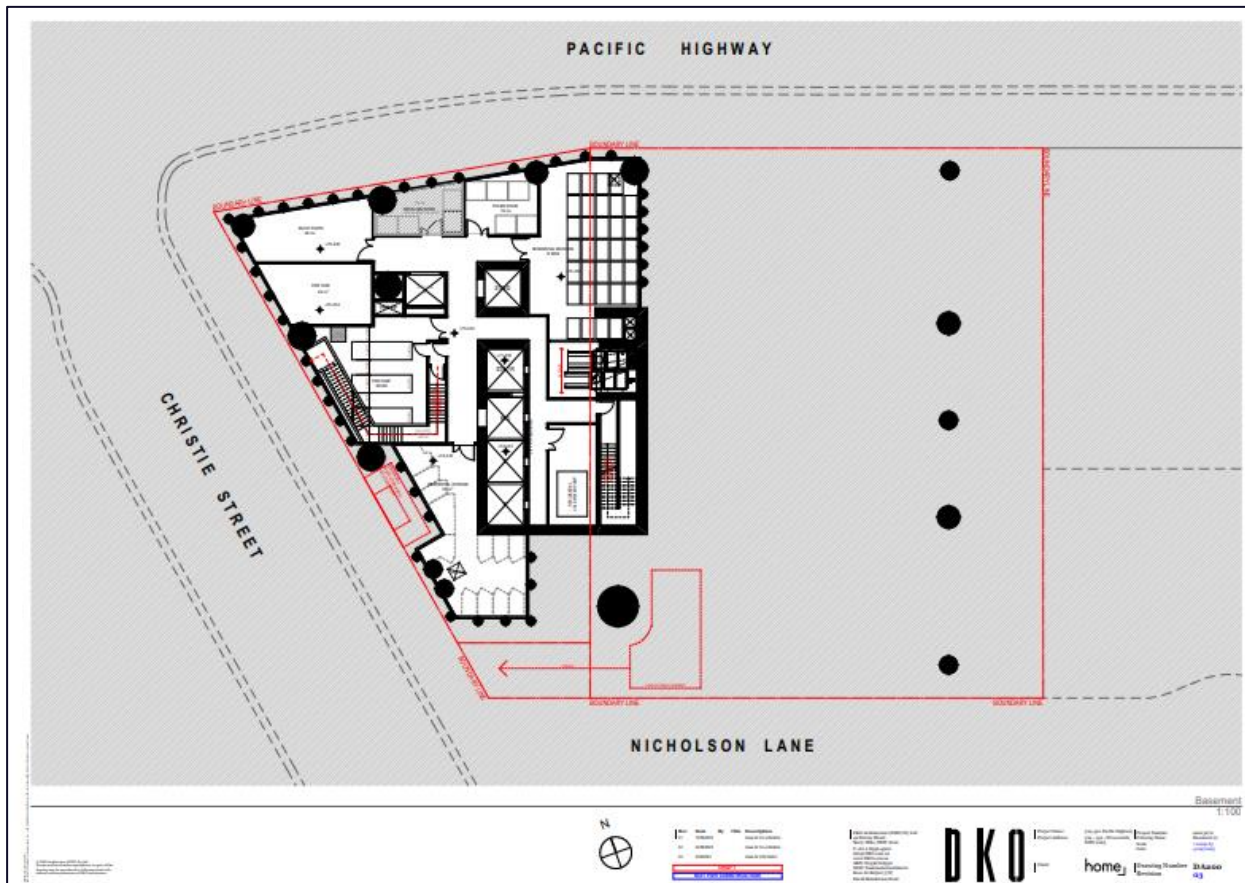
Proposed Basement Plan of 524-534 Pacific Highway (DKO Architecture, 2023)
